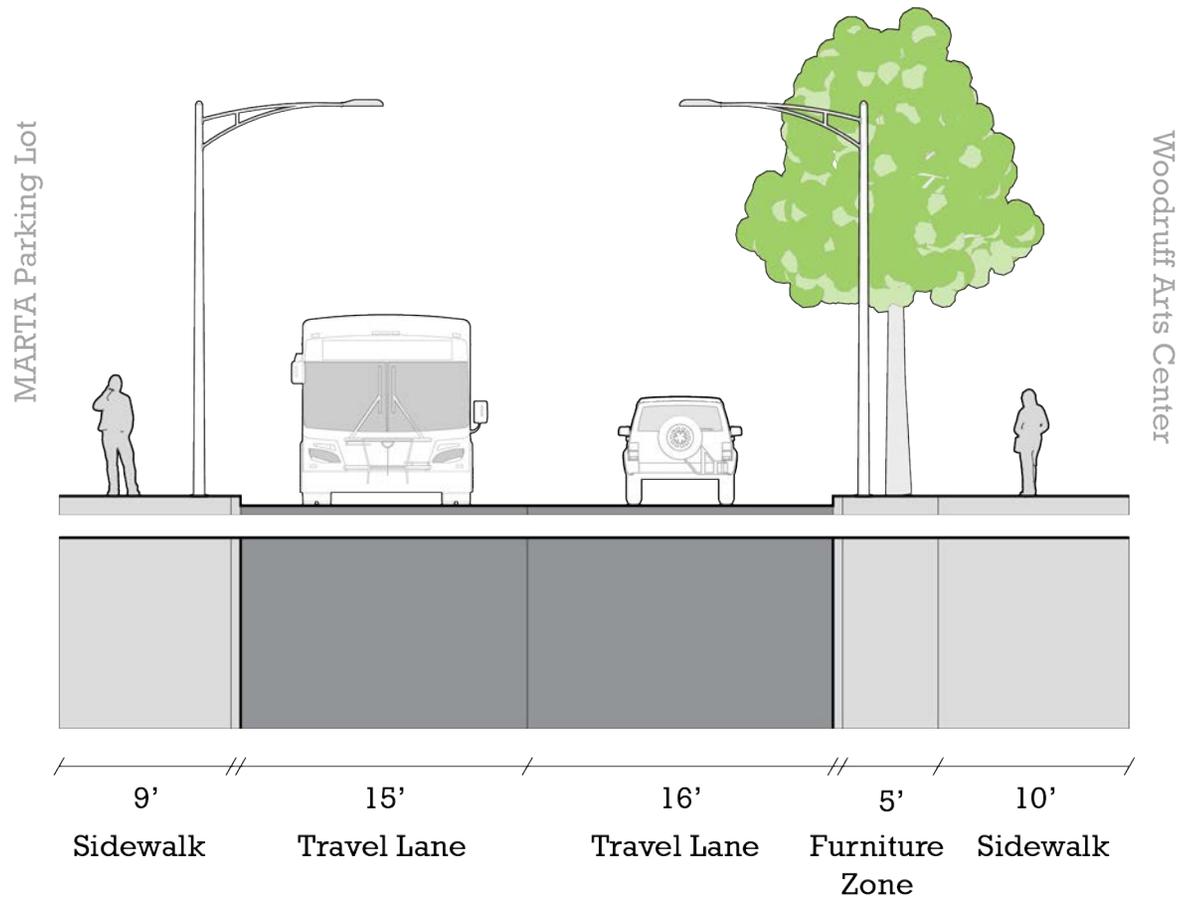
16th Street Typical Section at Arts Center Way Facing West
